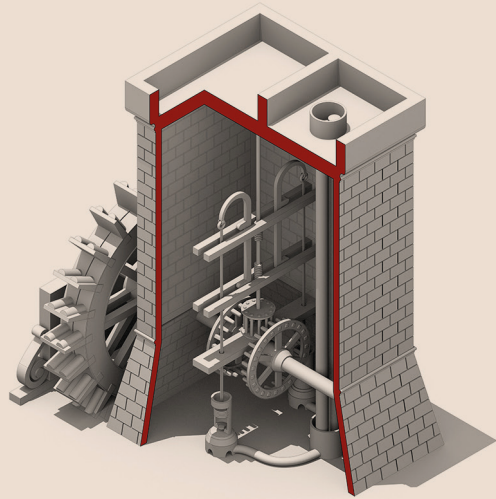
Axonometric exploded view drawing of the digital model from Plate I (model by D. Abbate).
